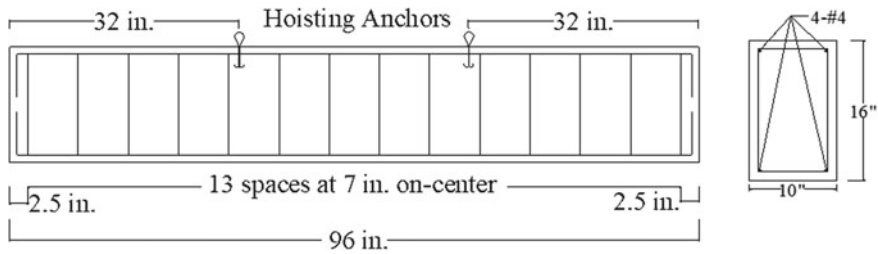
Hoisting arrangement and reinforcement layout of RC beam
